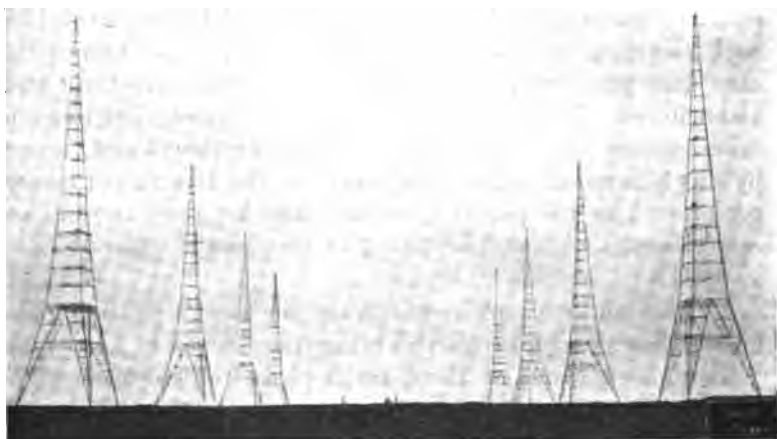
Completed project. Each tower is 840 feet high, including 12-foot foundation and 8-foot mast, and weighs approximately 570 tons.
